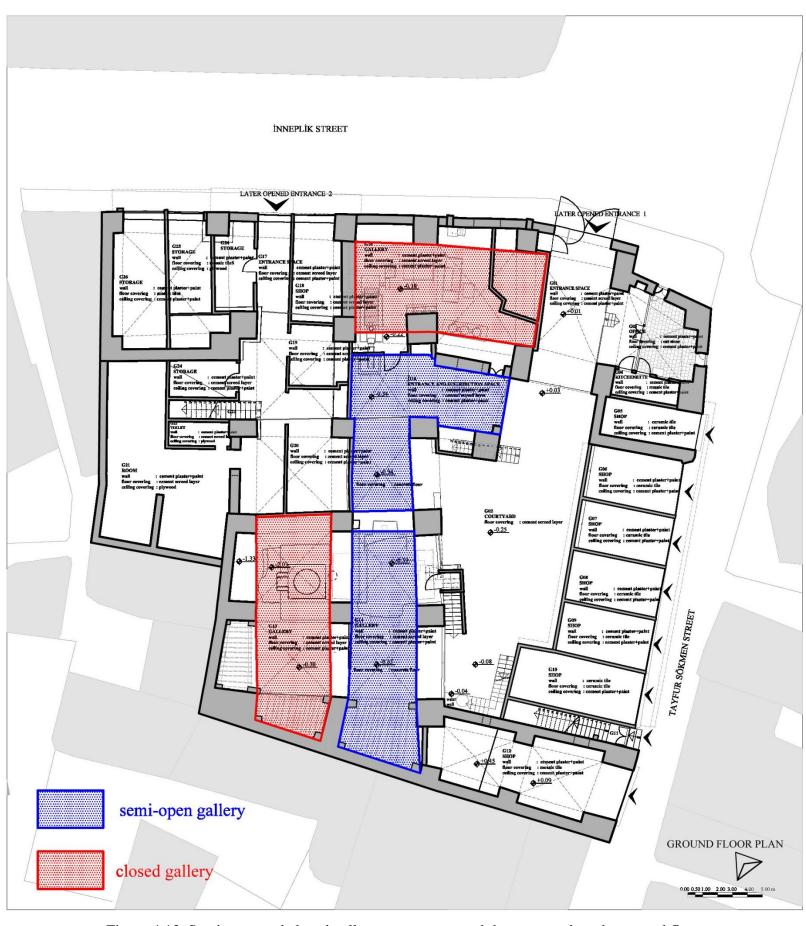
Semi-open and closed gallery spaces surround the courtyard on the ground floor
